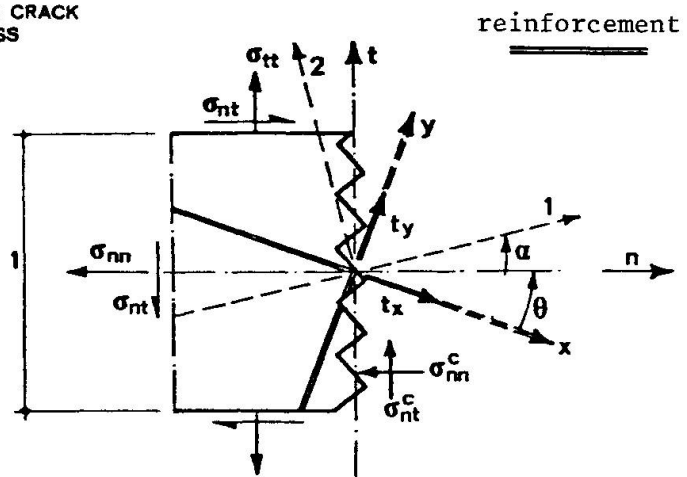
Sign conventions for a crack crossed by reinforcing bars.
